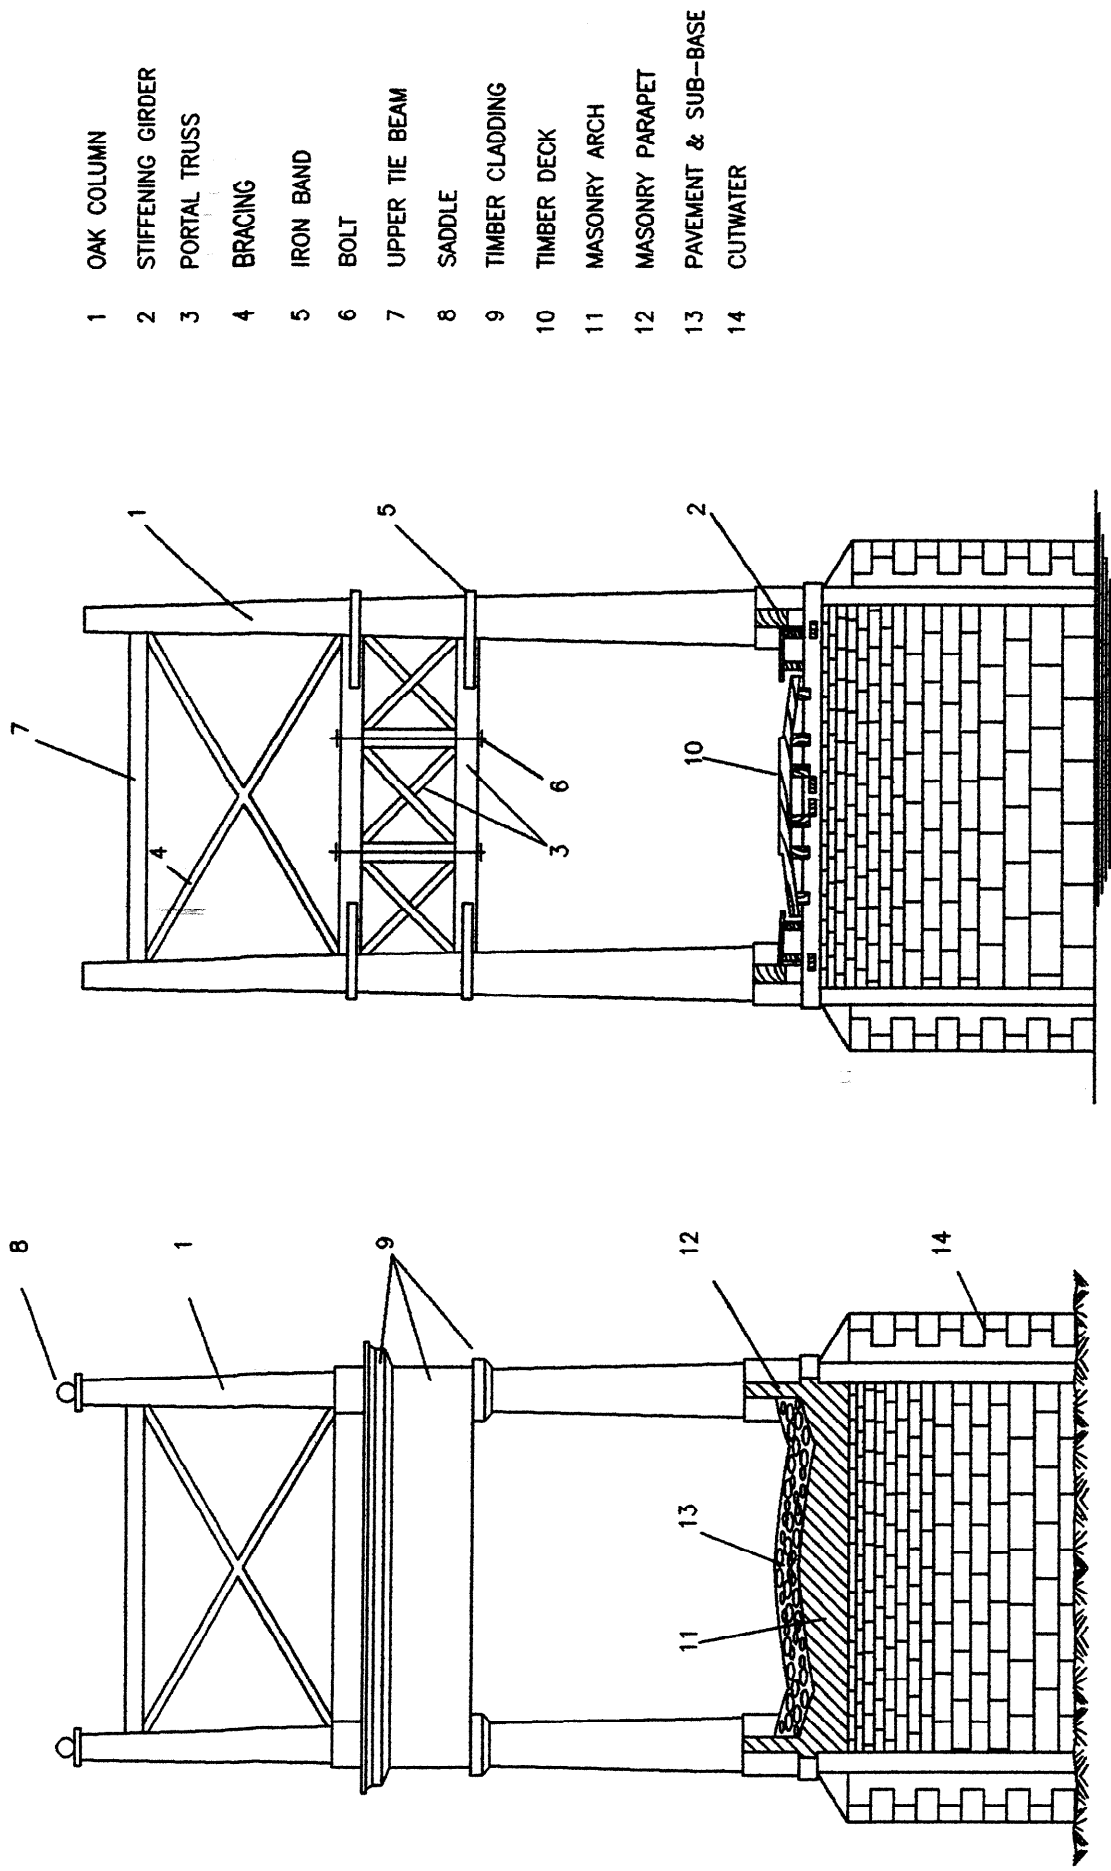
HALF ELEVATION OF NIENBURG BRIDGE
